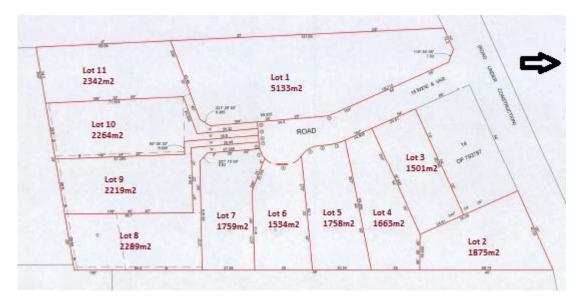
Proposed subdivision of 102 Hall Street, Pitt Town
